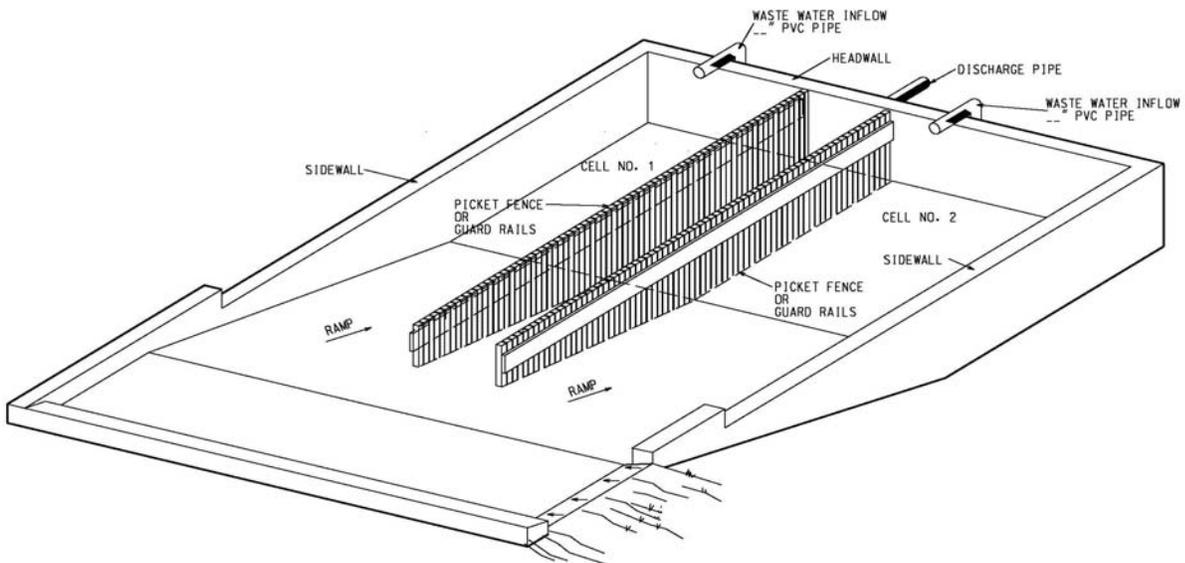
Concrete Vat Separator – Shared Picket Fence or Guard Rails
